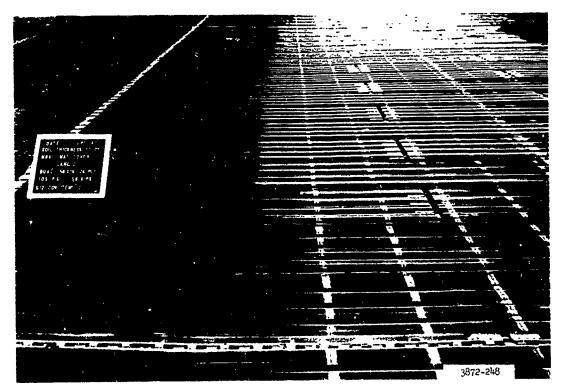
Test section I, lane 2, item 2, prior to traffic
